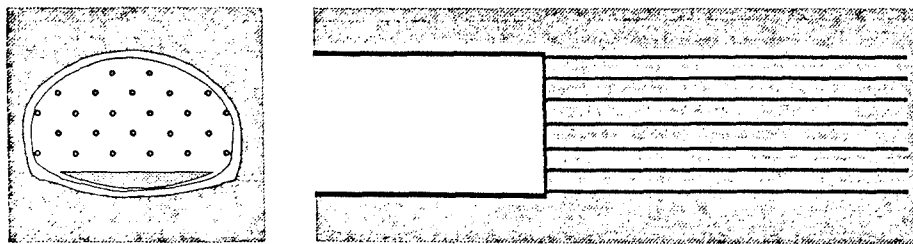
Soil nailing at the face of the excavation in soft ground tunnelling
